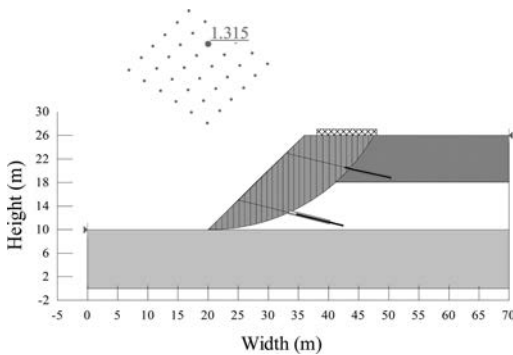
Example of stability analysis of a slope reinforced by anchors.
